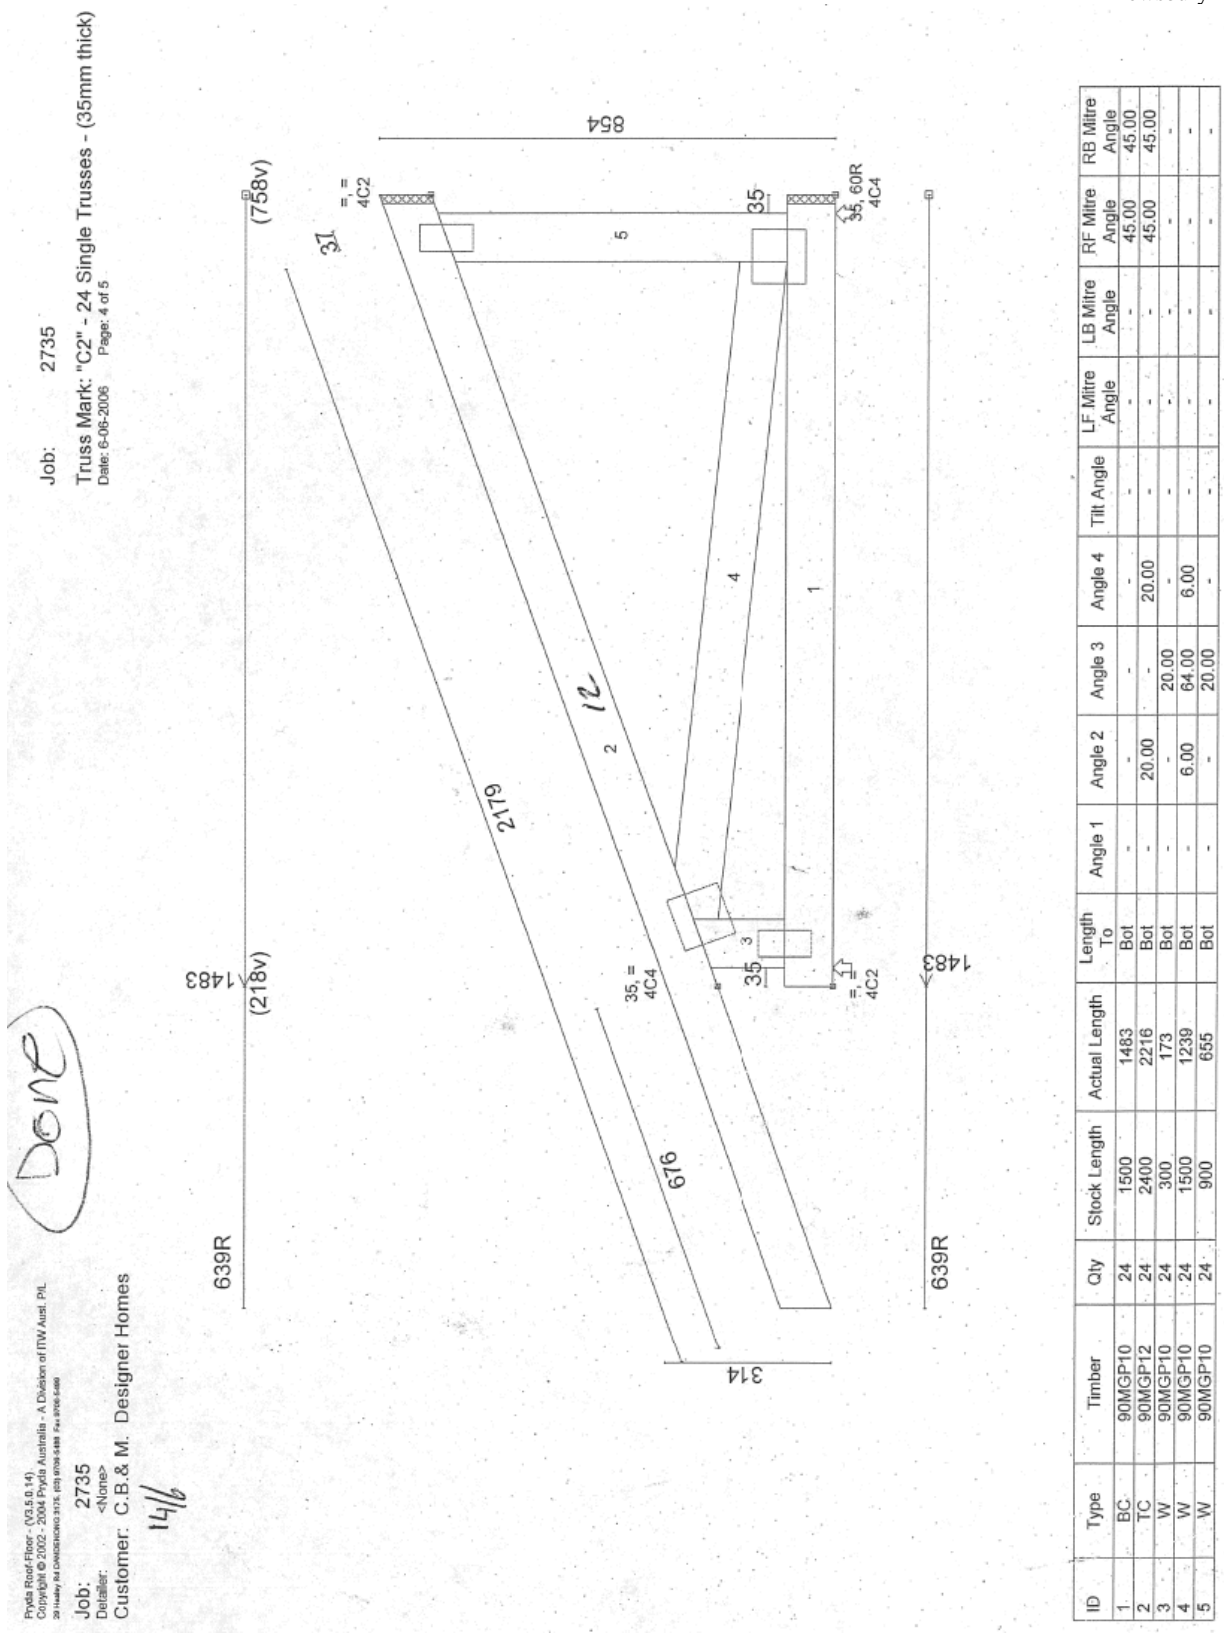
Test Cell 3 – Roof-framing Data: Truss C2 (not to scale)
